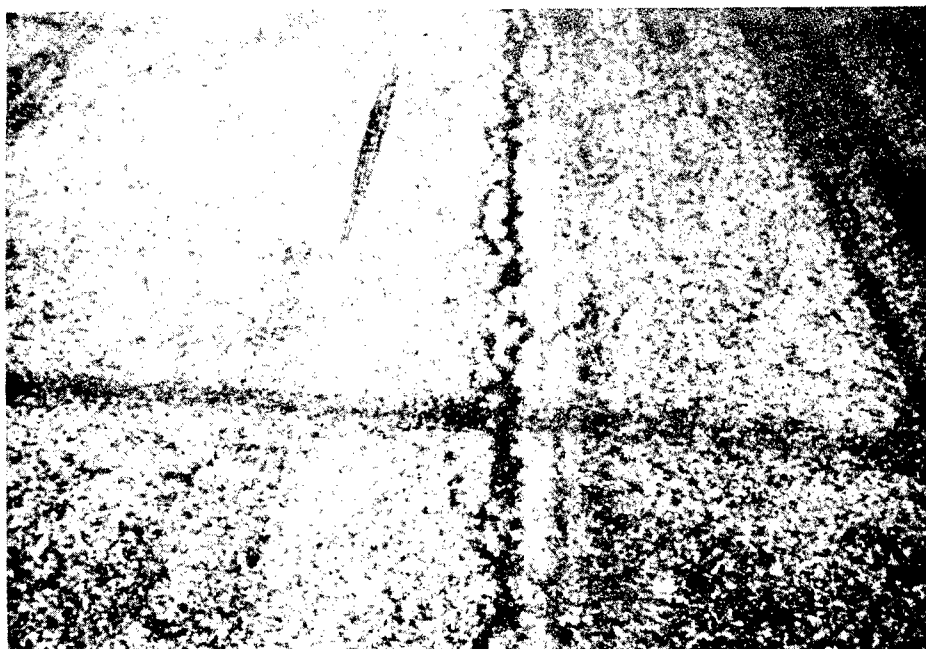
Medium severity longitudinal construction joint crack, flexible pavement, case 1
